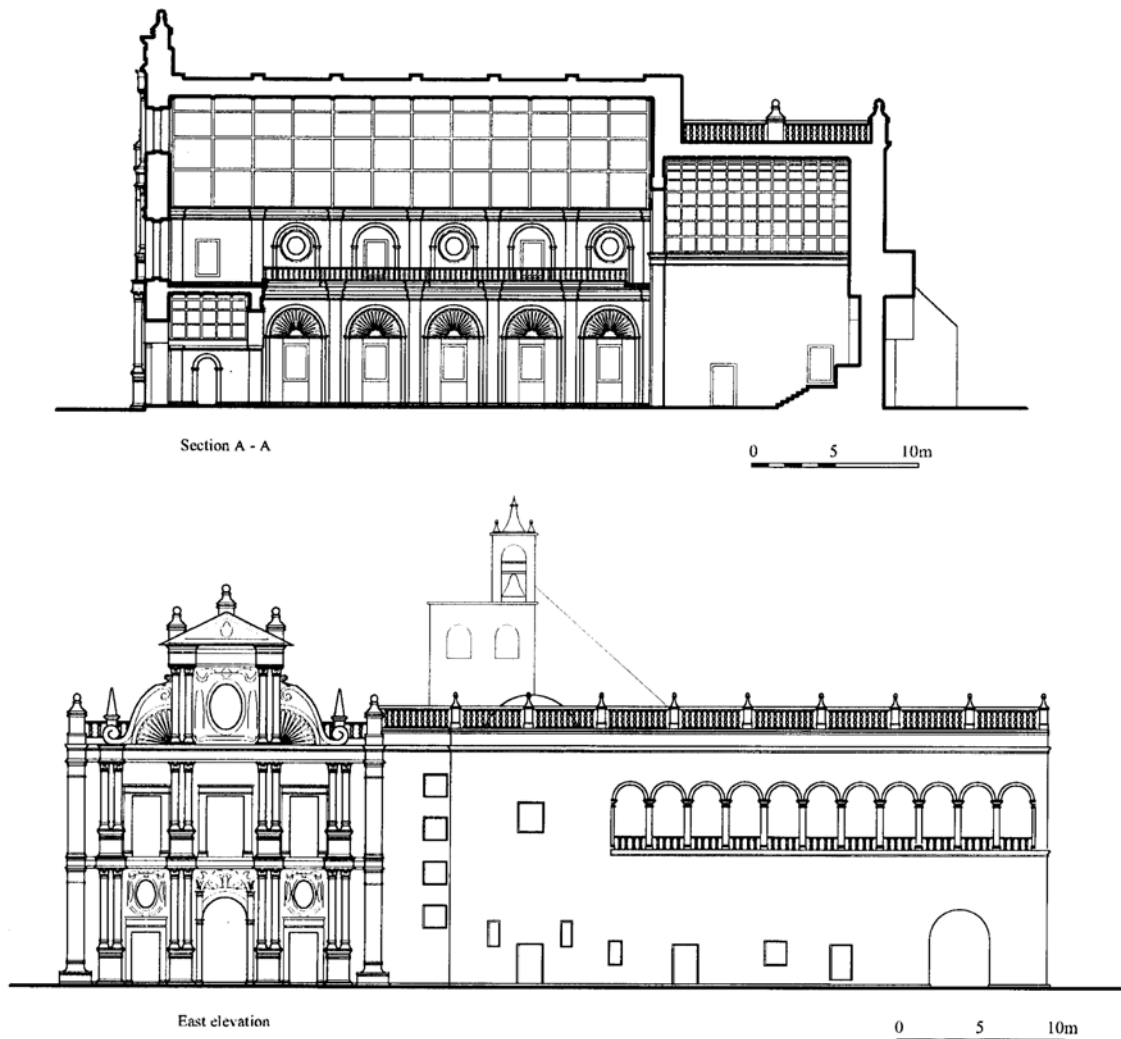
St Paul's church and seminary, above: longitudinal section A-A through the church; below: east elevation of the complex.
